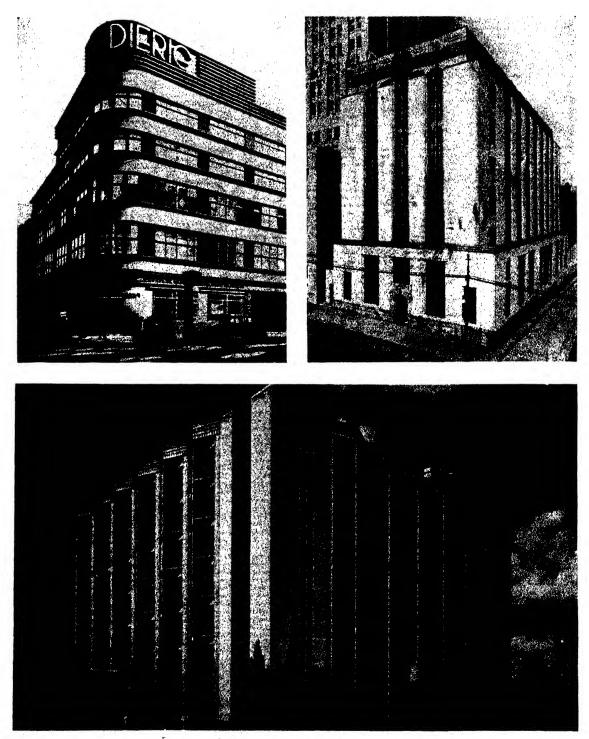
FIG. (A), above.—Panels between windows, together with cornice, are sheets of copper. Dierig House, Berlin. FIG. (B), above.—Aluminum used for top floor, roof, window spandrels, mullions, and ornament. Bank Bidg., Pittsburgh.
